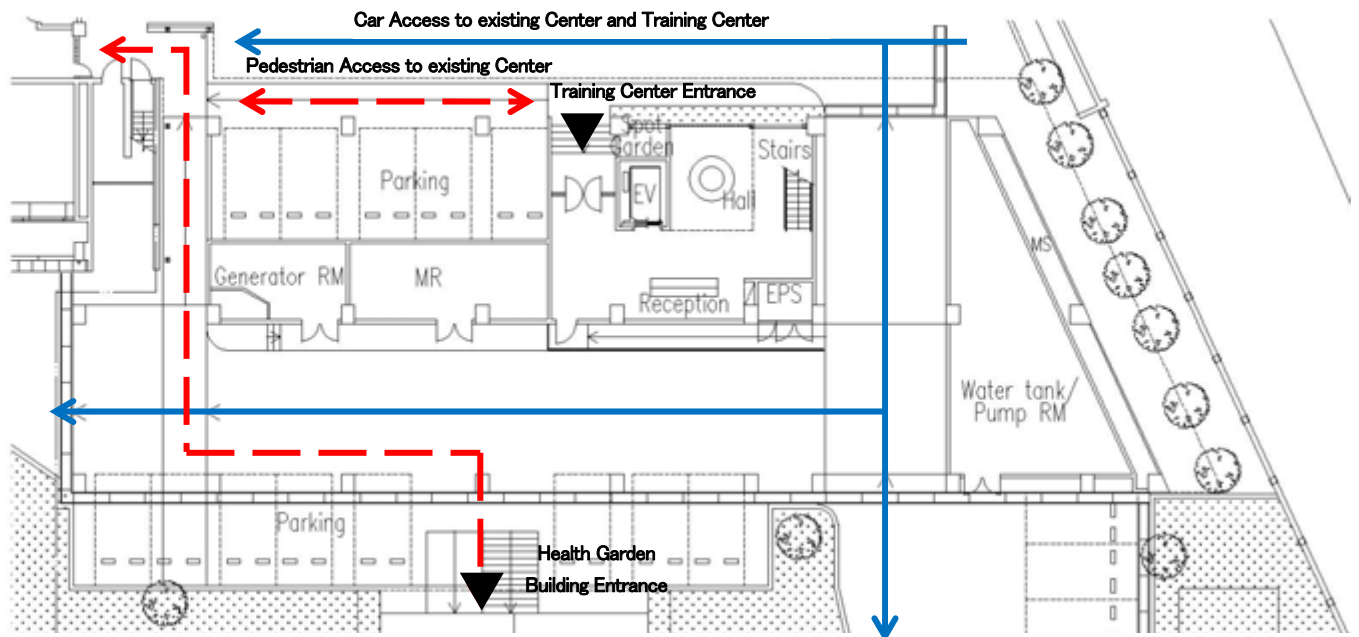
Training Center 1<sup>st</sup> Floor Plan
